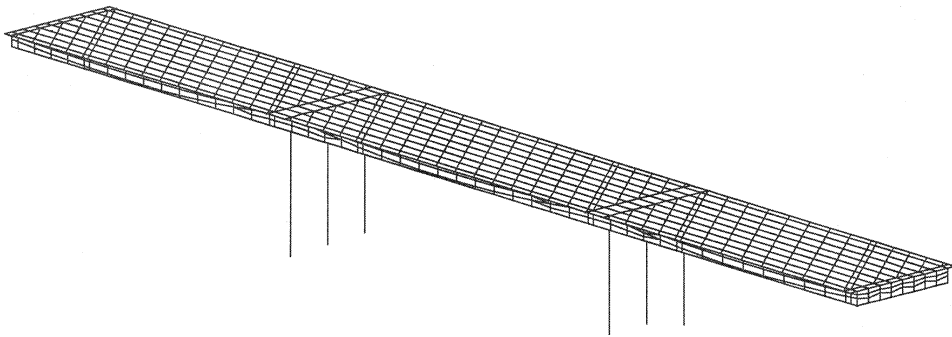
Concrete box girder with 45° skewed supports finite-element model.
